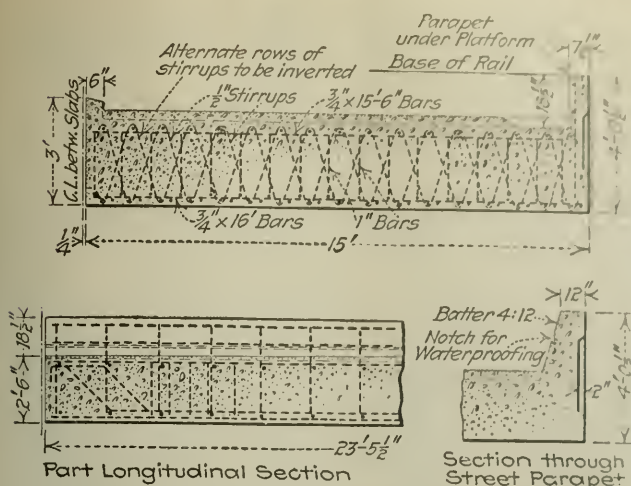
CONCRETE DECK SLAB OF COLUMBIA AVE. BRIDGE
